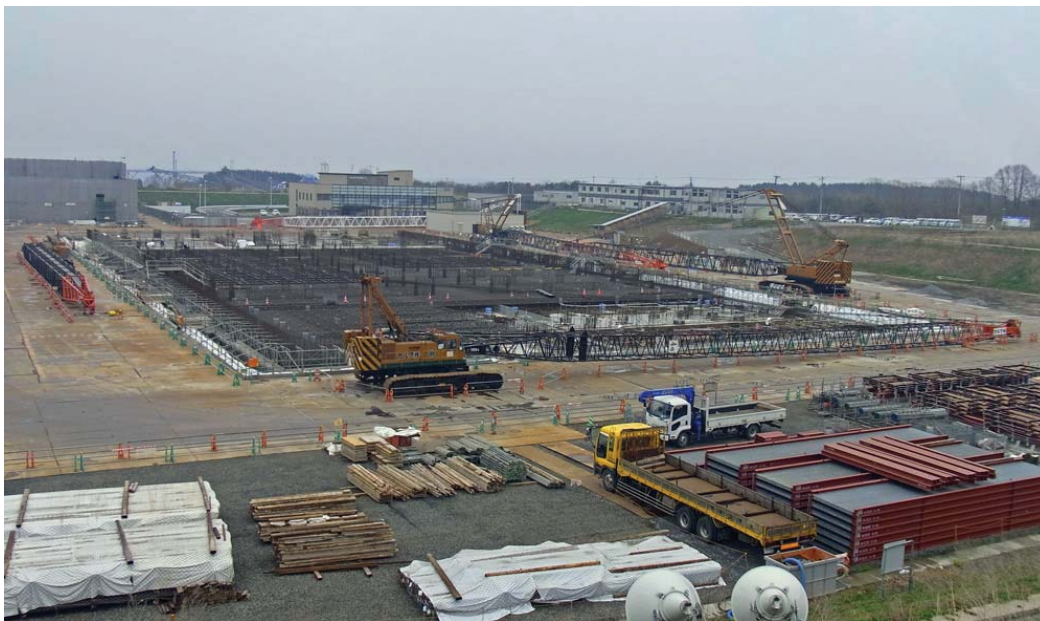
Construction site view of Recyclable-Fuel Storage Center
